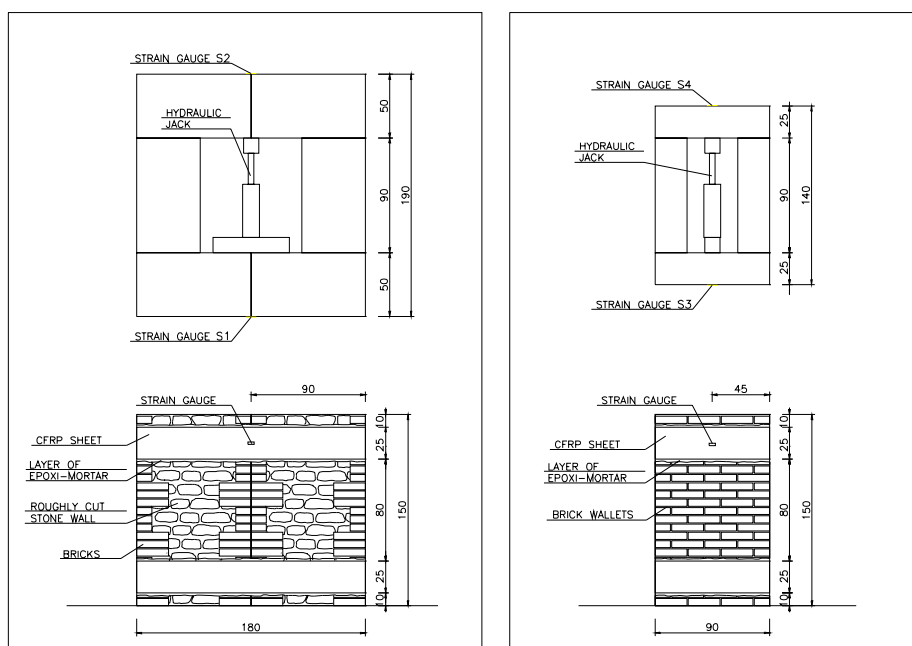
Layout of masonry cells with the position of CFRP sheets
